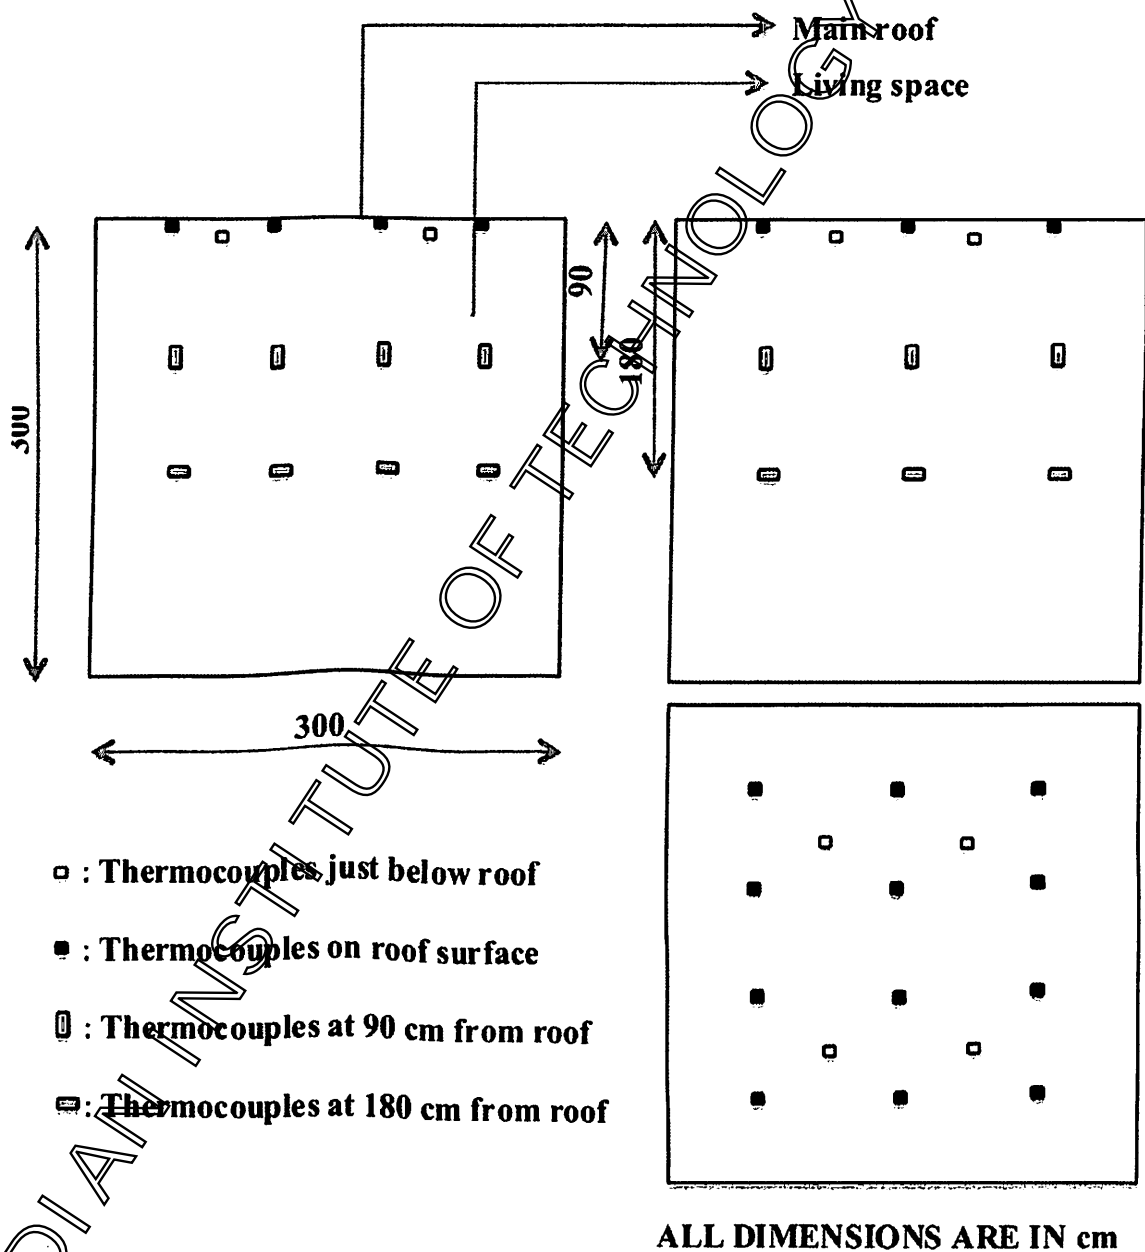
Location of thermocouples in RCC roofed dwelling
